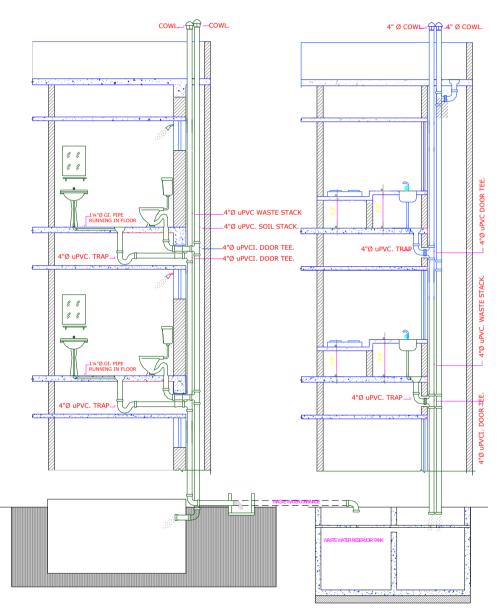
PROPOSED WASTE WATER COLLECTION SYSTEM
